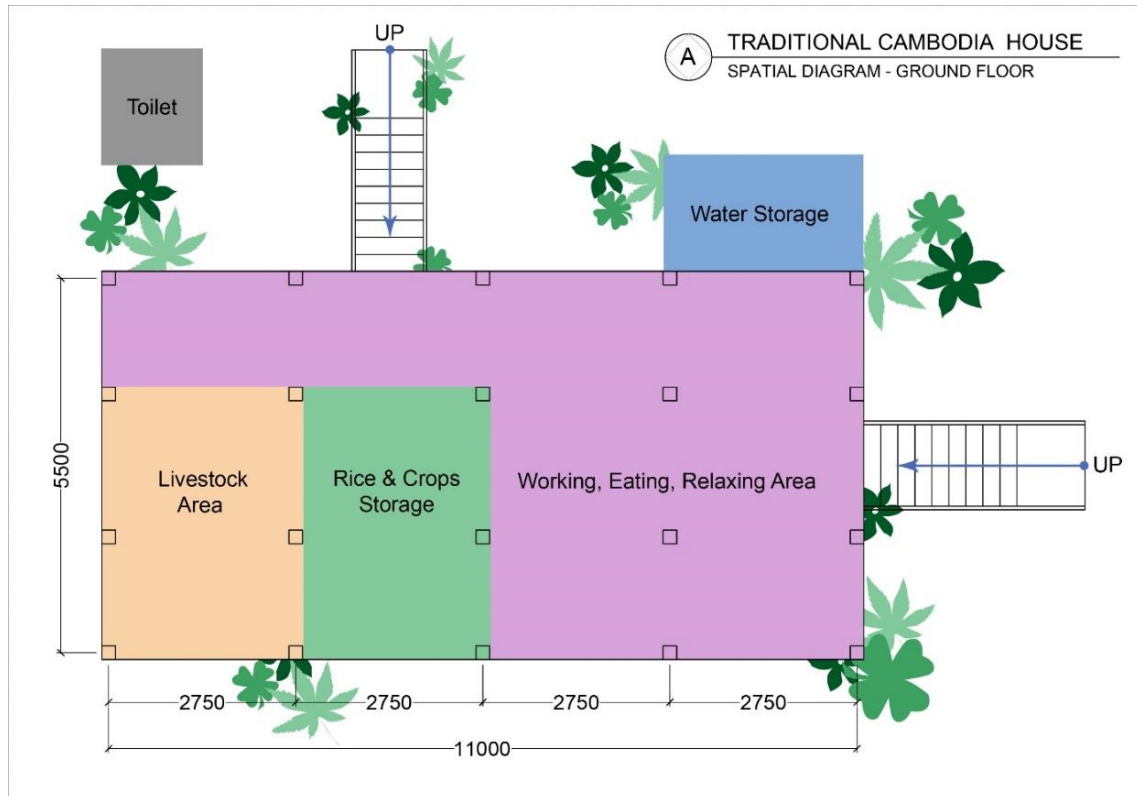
Spatial Diagram of Traditional Cambodian house – Ground Floor (Author)
